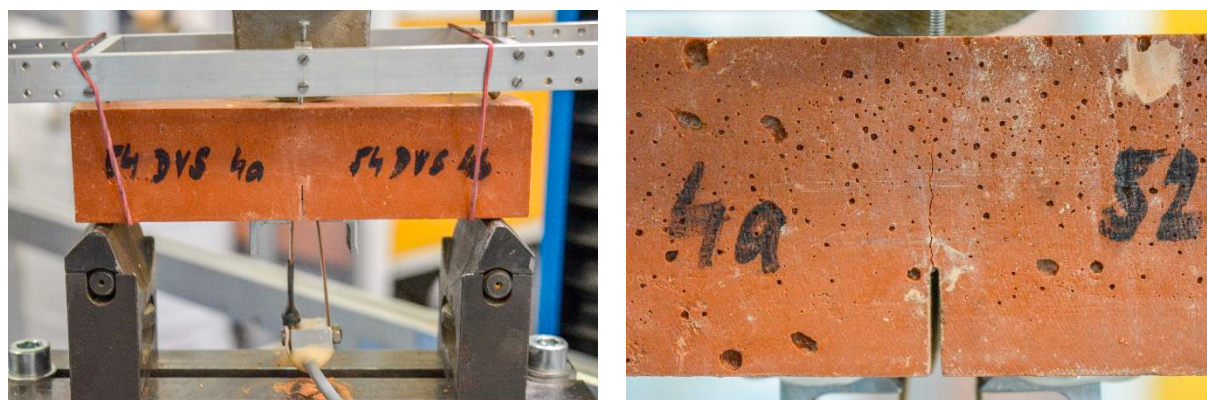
Illustration of the three-point bending fracture test configuration (left) and detail of a test specimen with a magistral crack (right).
